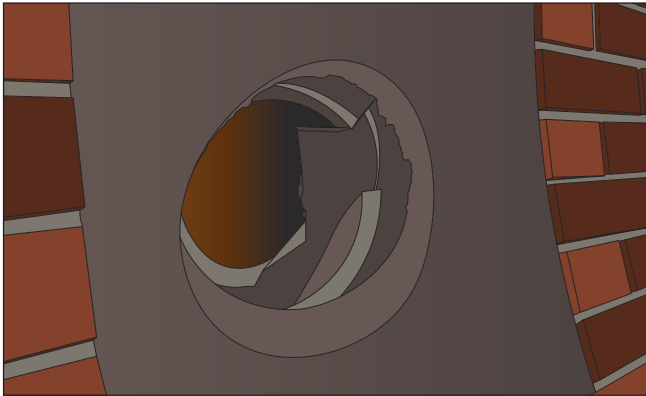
Connection of branches in poor structural condition illustrations (1)
